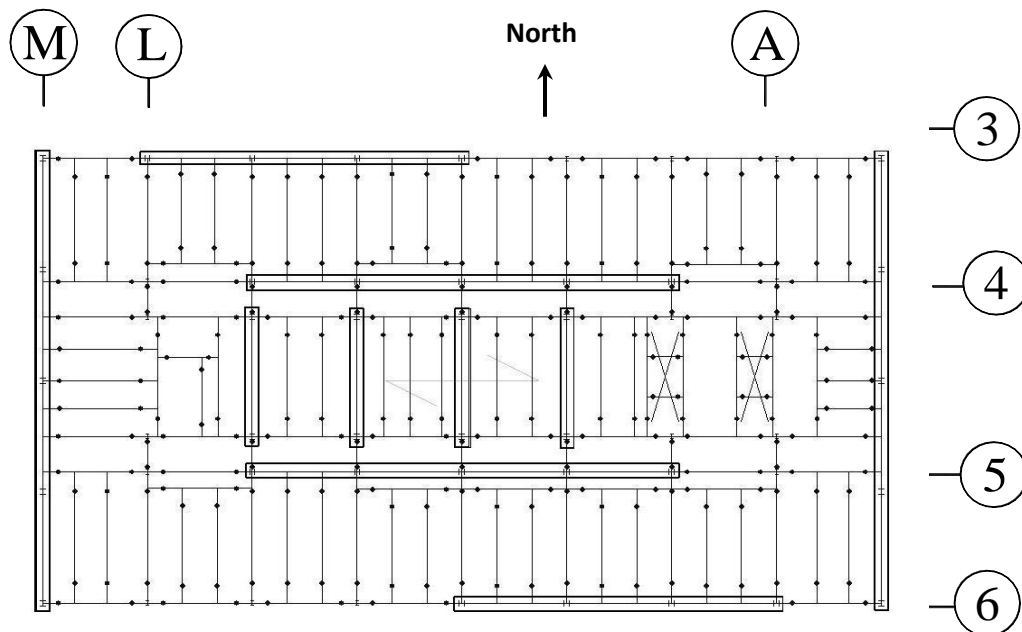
Typical Building Plan with locations of moment frames highlighted
